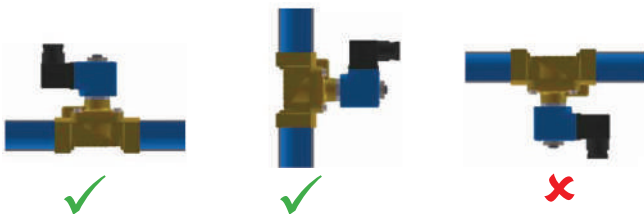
Solenoid valve connection form (a) Right, (b) Right, (c) Wrong
